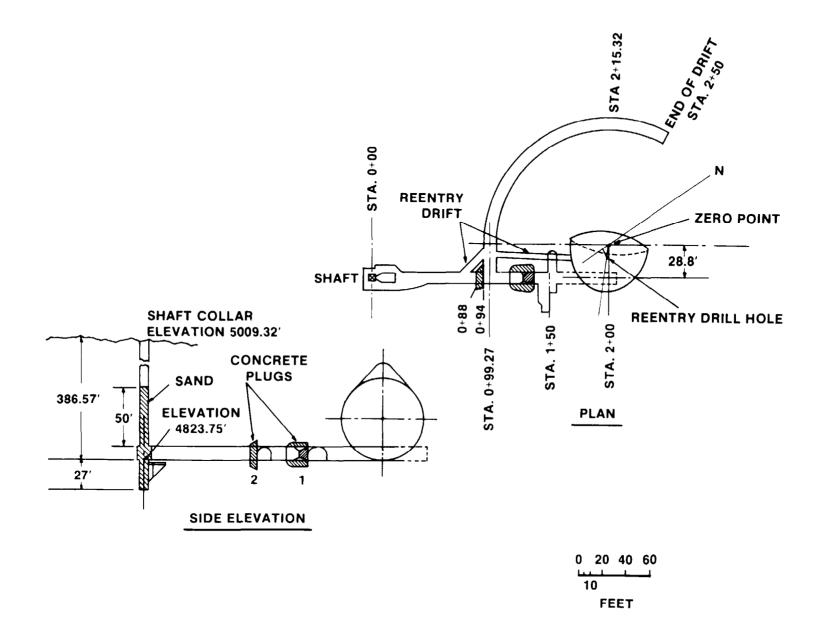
Plan and Elevation of TINY TOT Excavations
